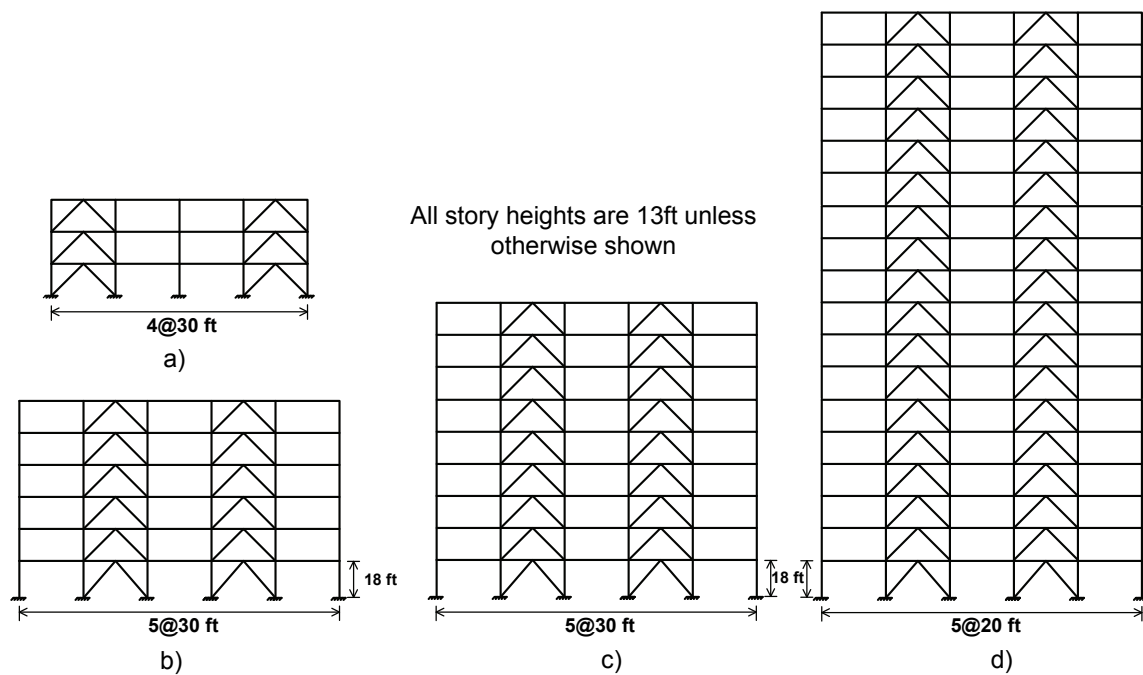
Plan and Elevation Views of CBF Buildings: (a) 3-Story; (b) 6-Story; (c) 9-Story; and (d) 18-Story.
